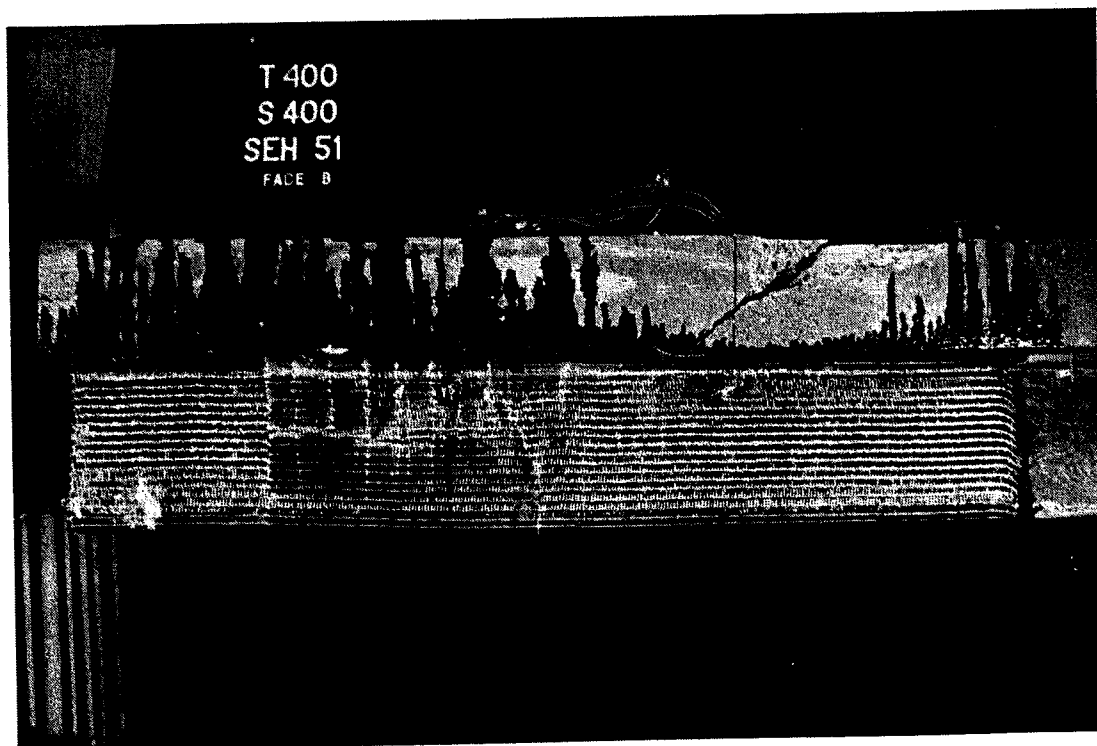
T4S4G90 Specimen after Failure (Face B)
